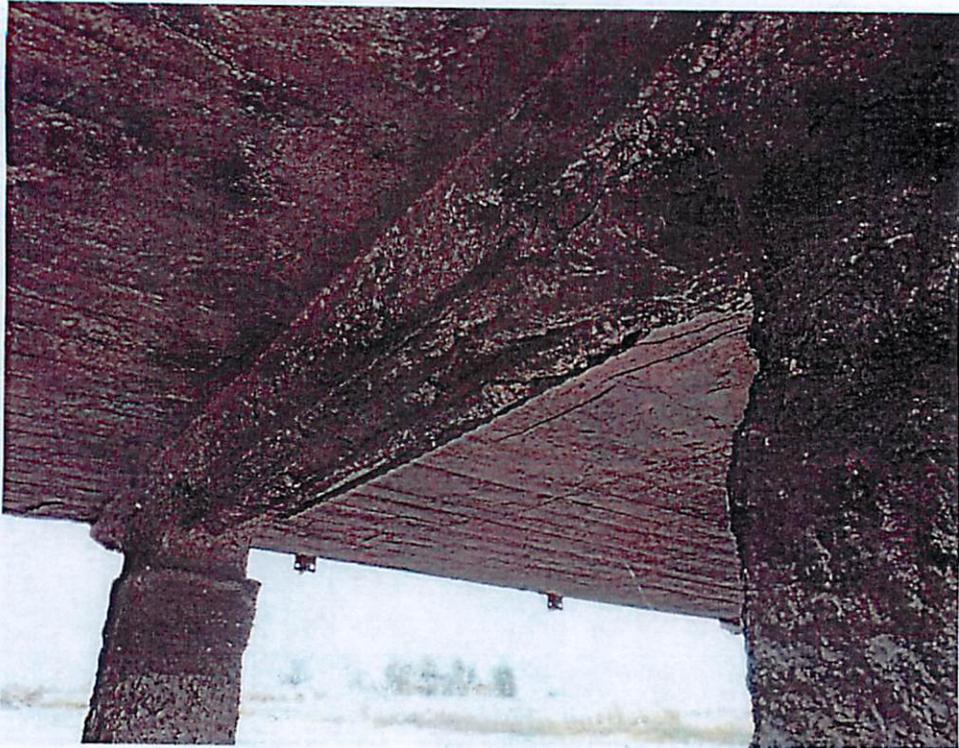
exposed reinforcing and deteriorated concrete. Typical of all three pier caps.
